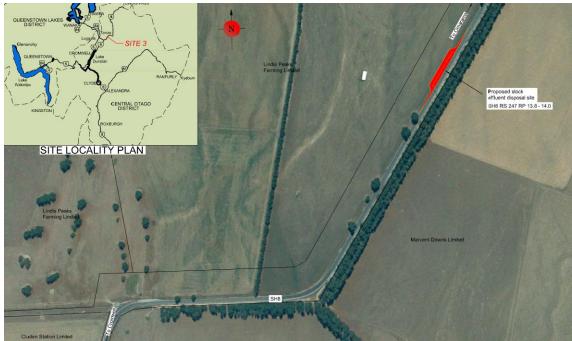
Lindis Peak Straight - Proposed Site Plan
